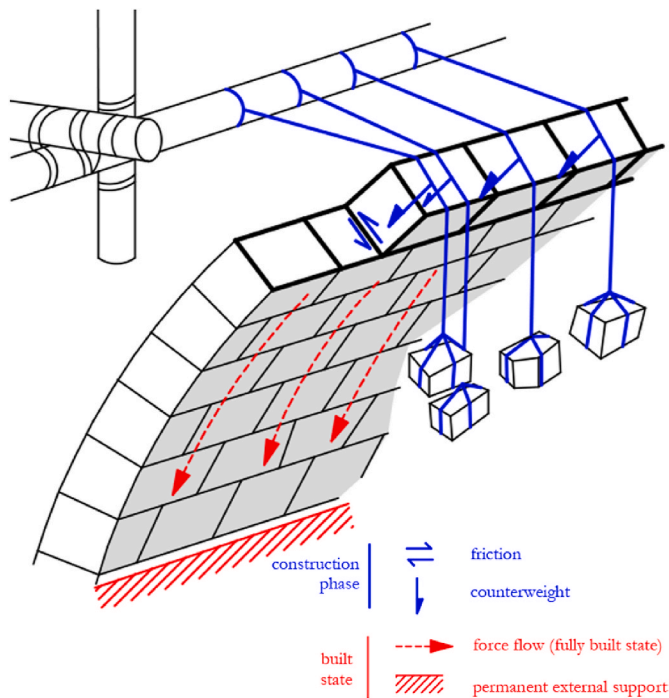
Cable system structural schematic for a masonry arch showing how suspended weights can be used induce compressive forces into the structure to resist overturning.
